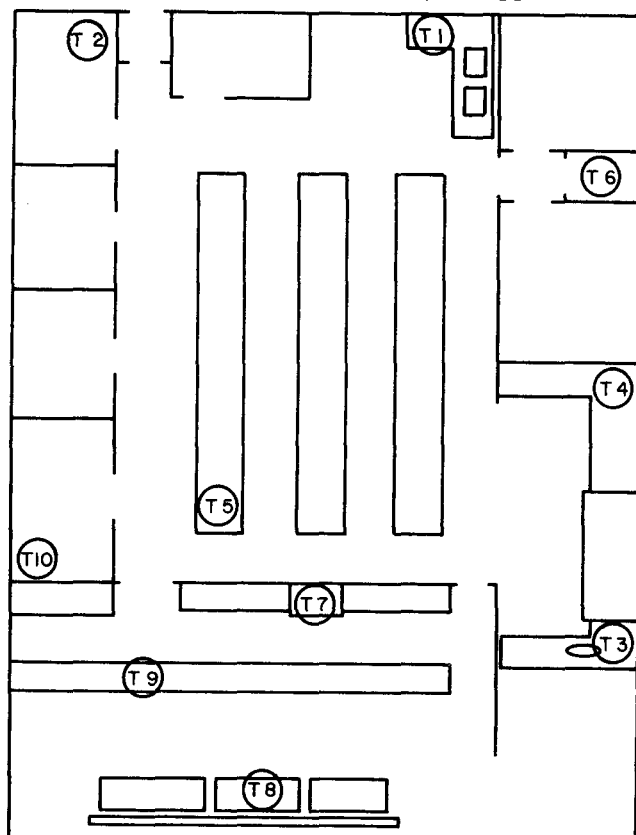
Floor plan of a typical food handling facility showing cockroach trap locations (see fig 3-4).
